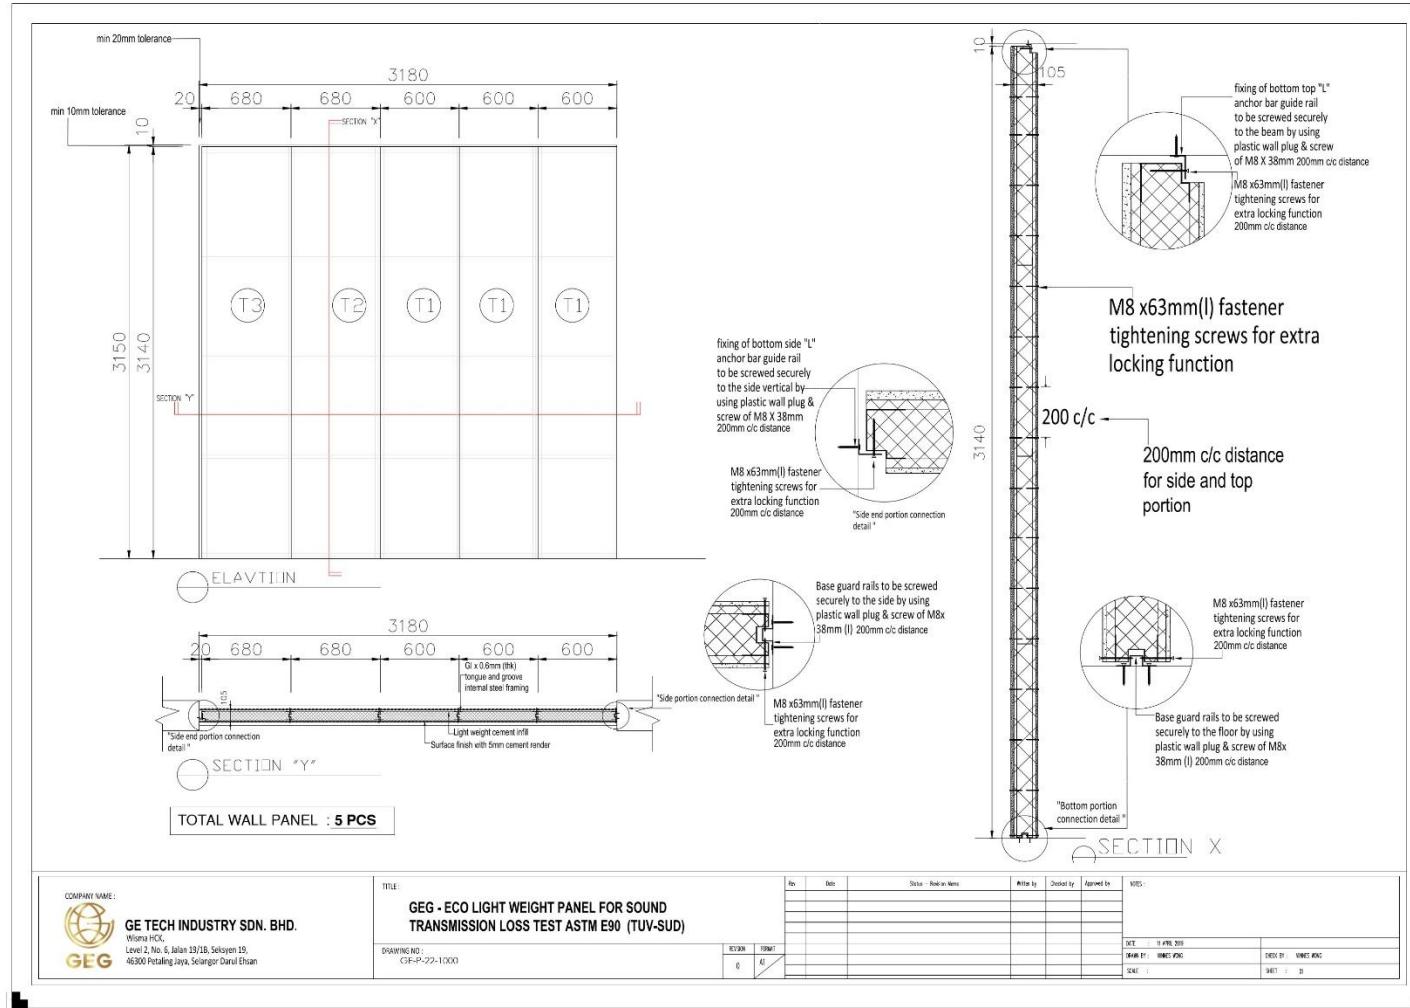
“GEG ECO” lightweight wall panels system facing the receiving room
